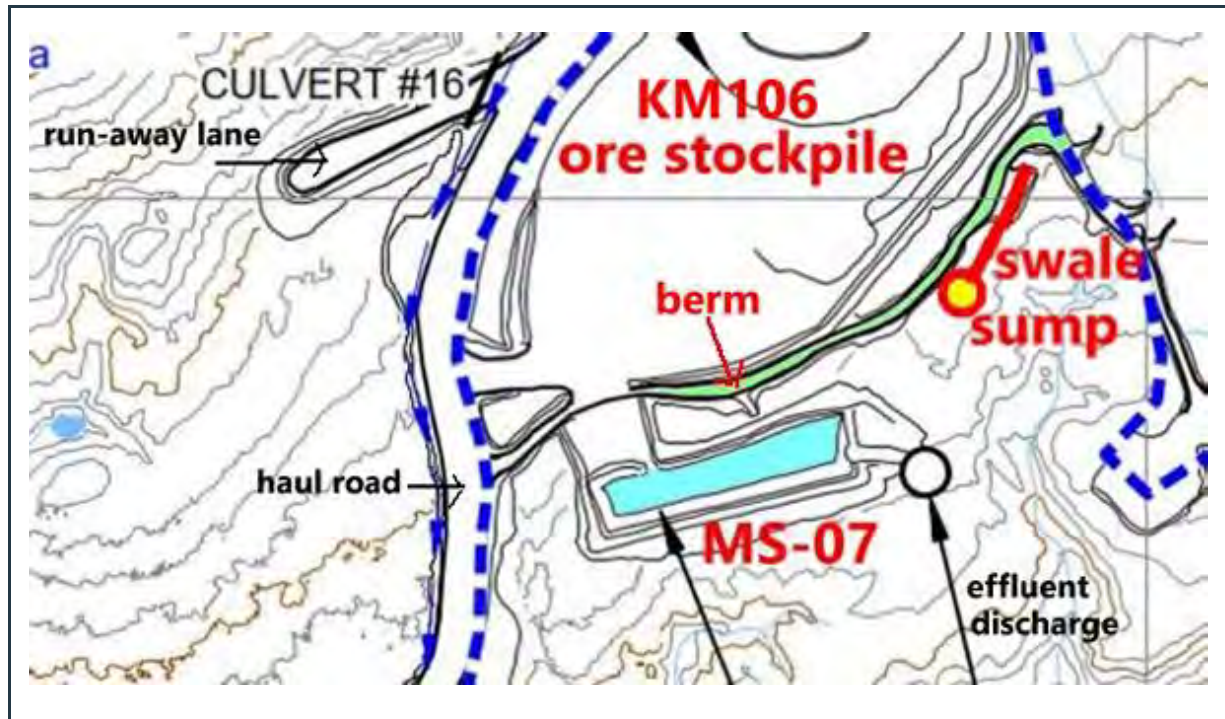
Site layout – Mary River Mine Site – South-Eastern Zone – KM106 run-of-mine ore storage facility and KM106/MS-07 run of mine ore stockpile pond.
